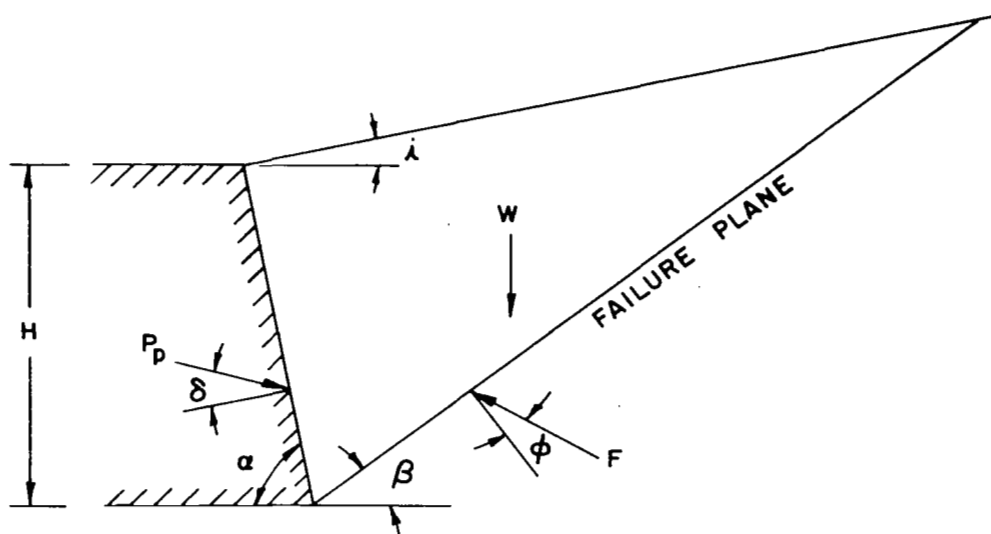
PASSIVE FAILURE WEDGE BEHIND A RETAINING WALL
